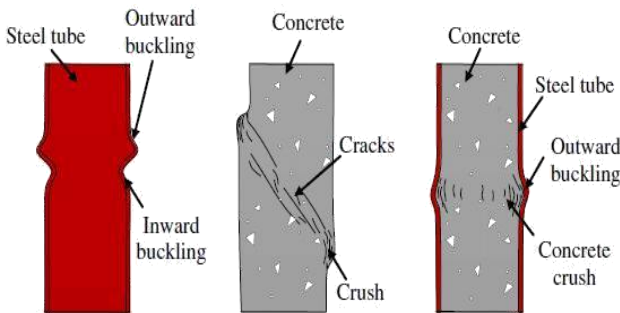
Schematic failure modes of hollow steel tube, concrete and CFST stub columns
